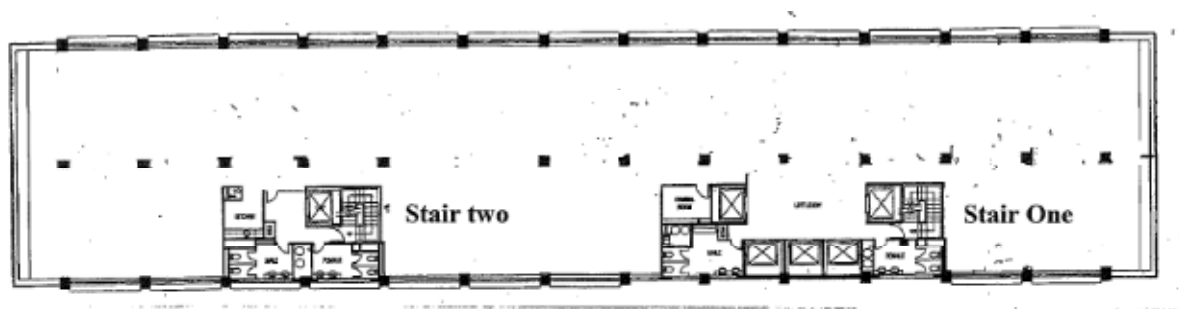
Unisys Floor Plan (MacLennan, 2011)
